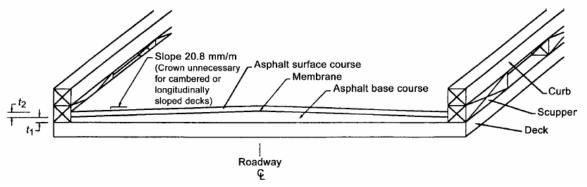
Asphalt Wearing Surface on a Concrete Deck
